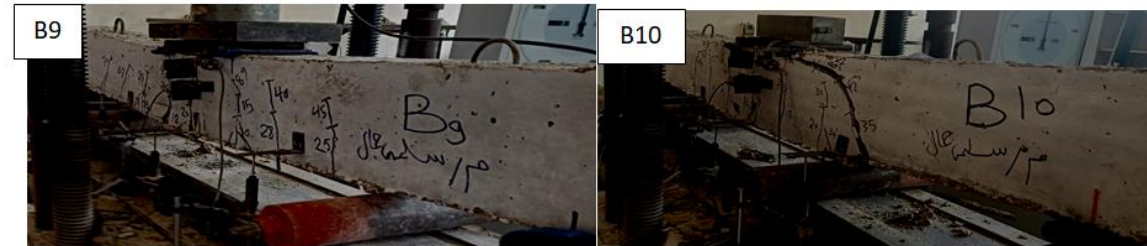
Crack patterns for beams of Group III (GFRP bars and fibers).
